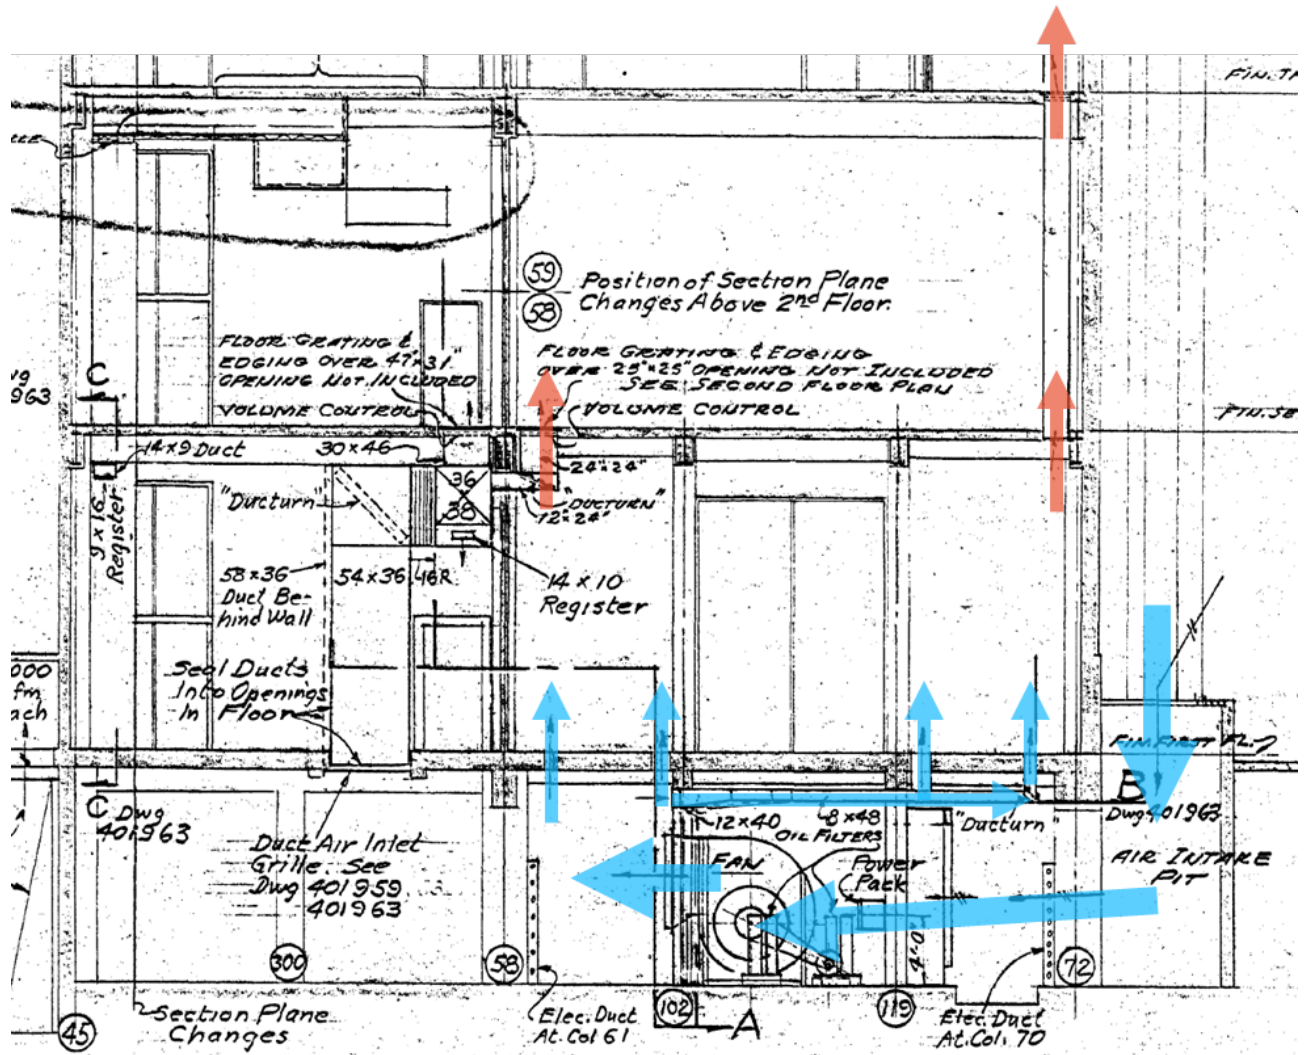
Diagram of intended outside air flow path for the ventilation of the switchgear room.³⁵
